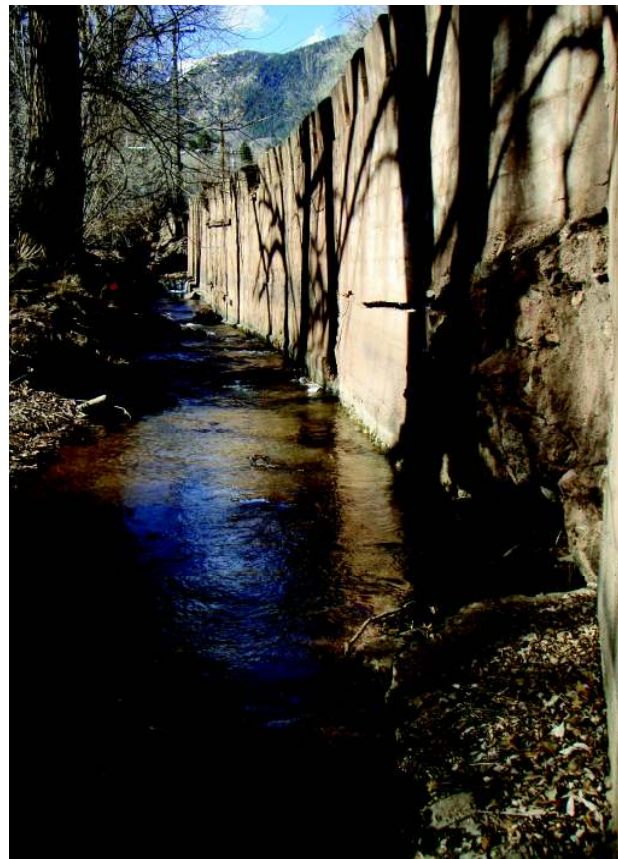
Unusual combination cover formed by failing concrete retaining wall footings - Lover's Lane retaining wall - Reach 7.
